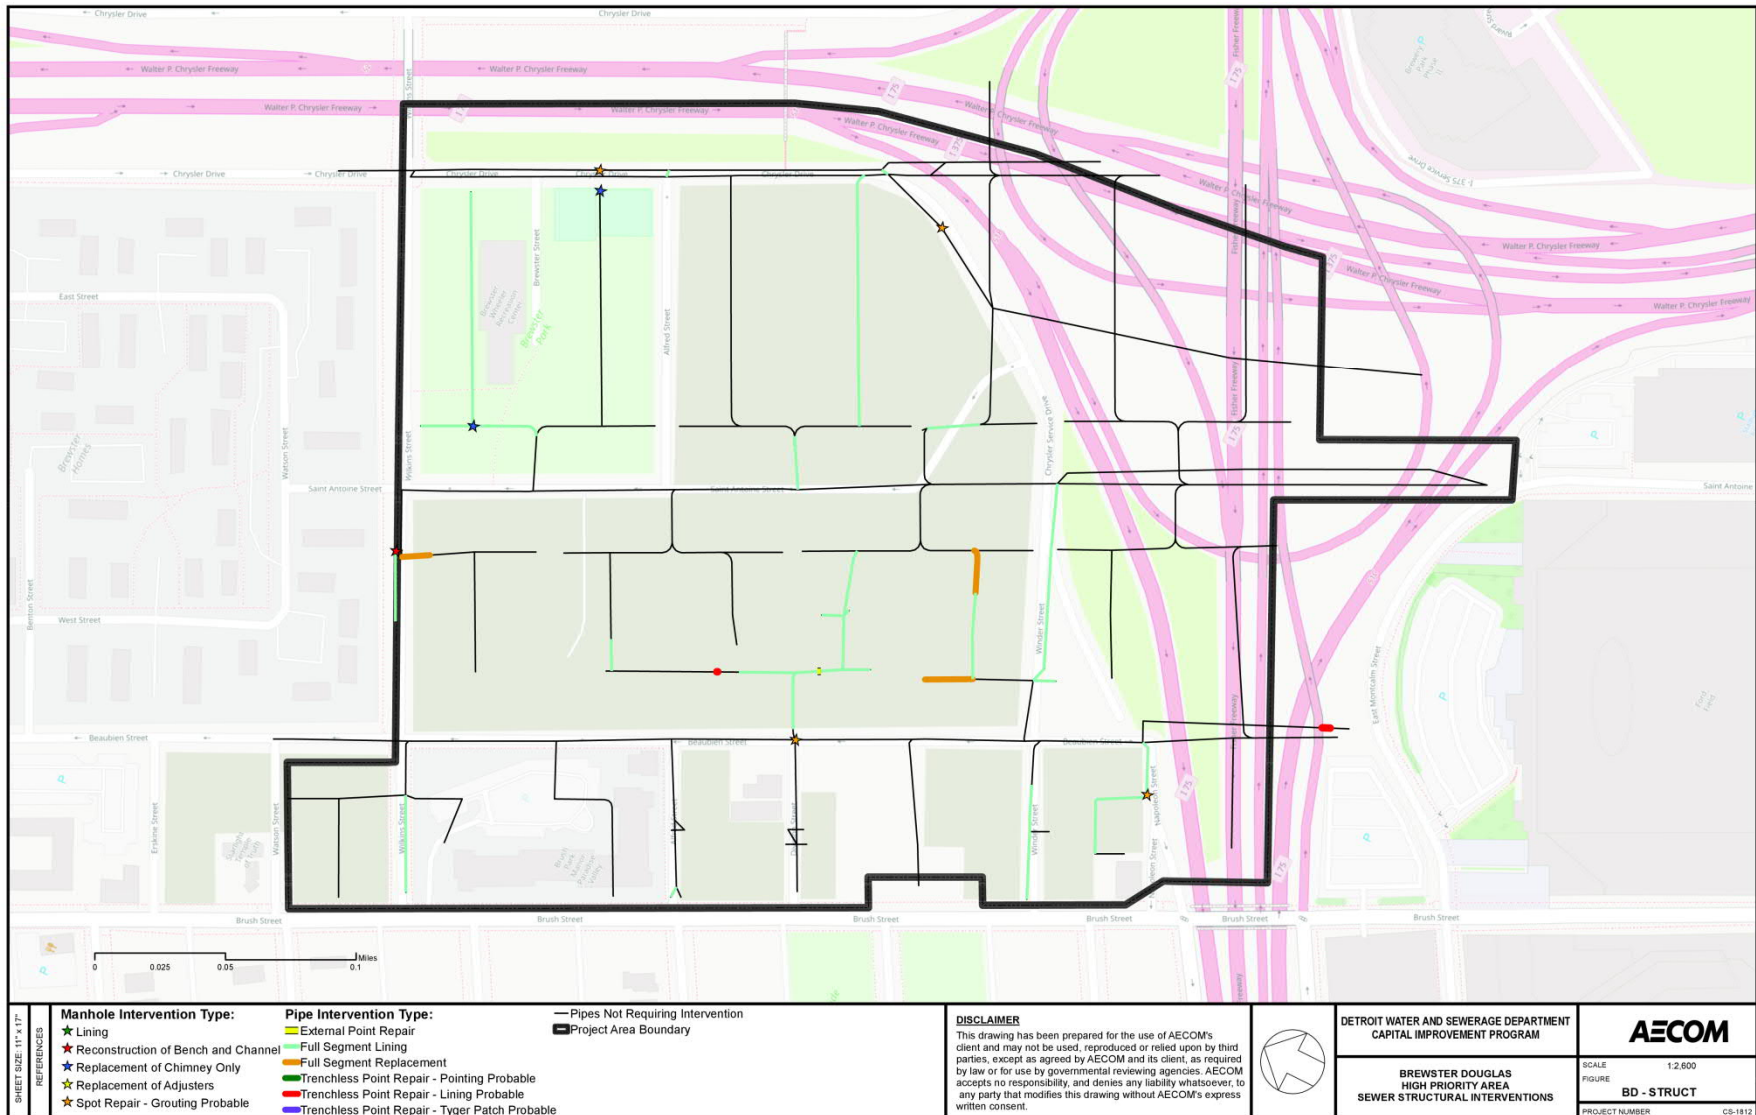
Brewster – Douglas Sewer Structural Repairs
